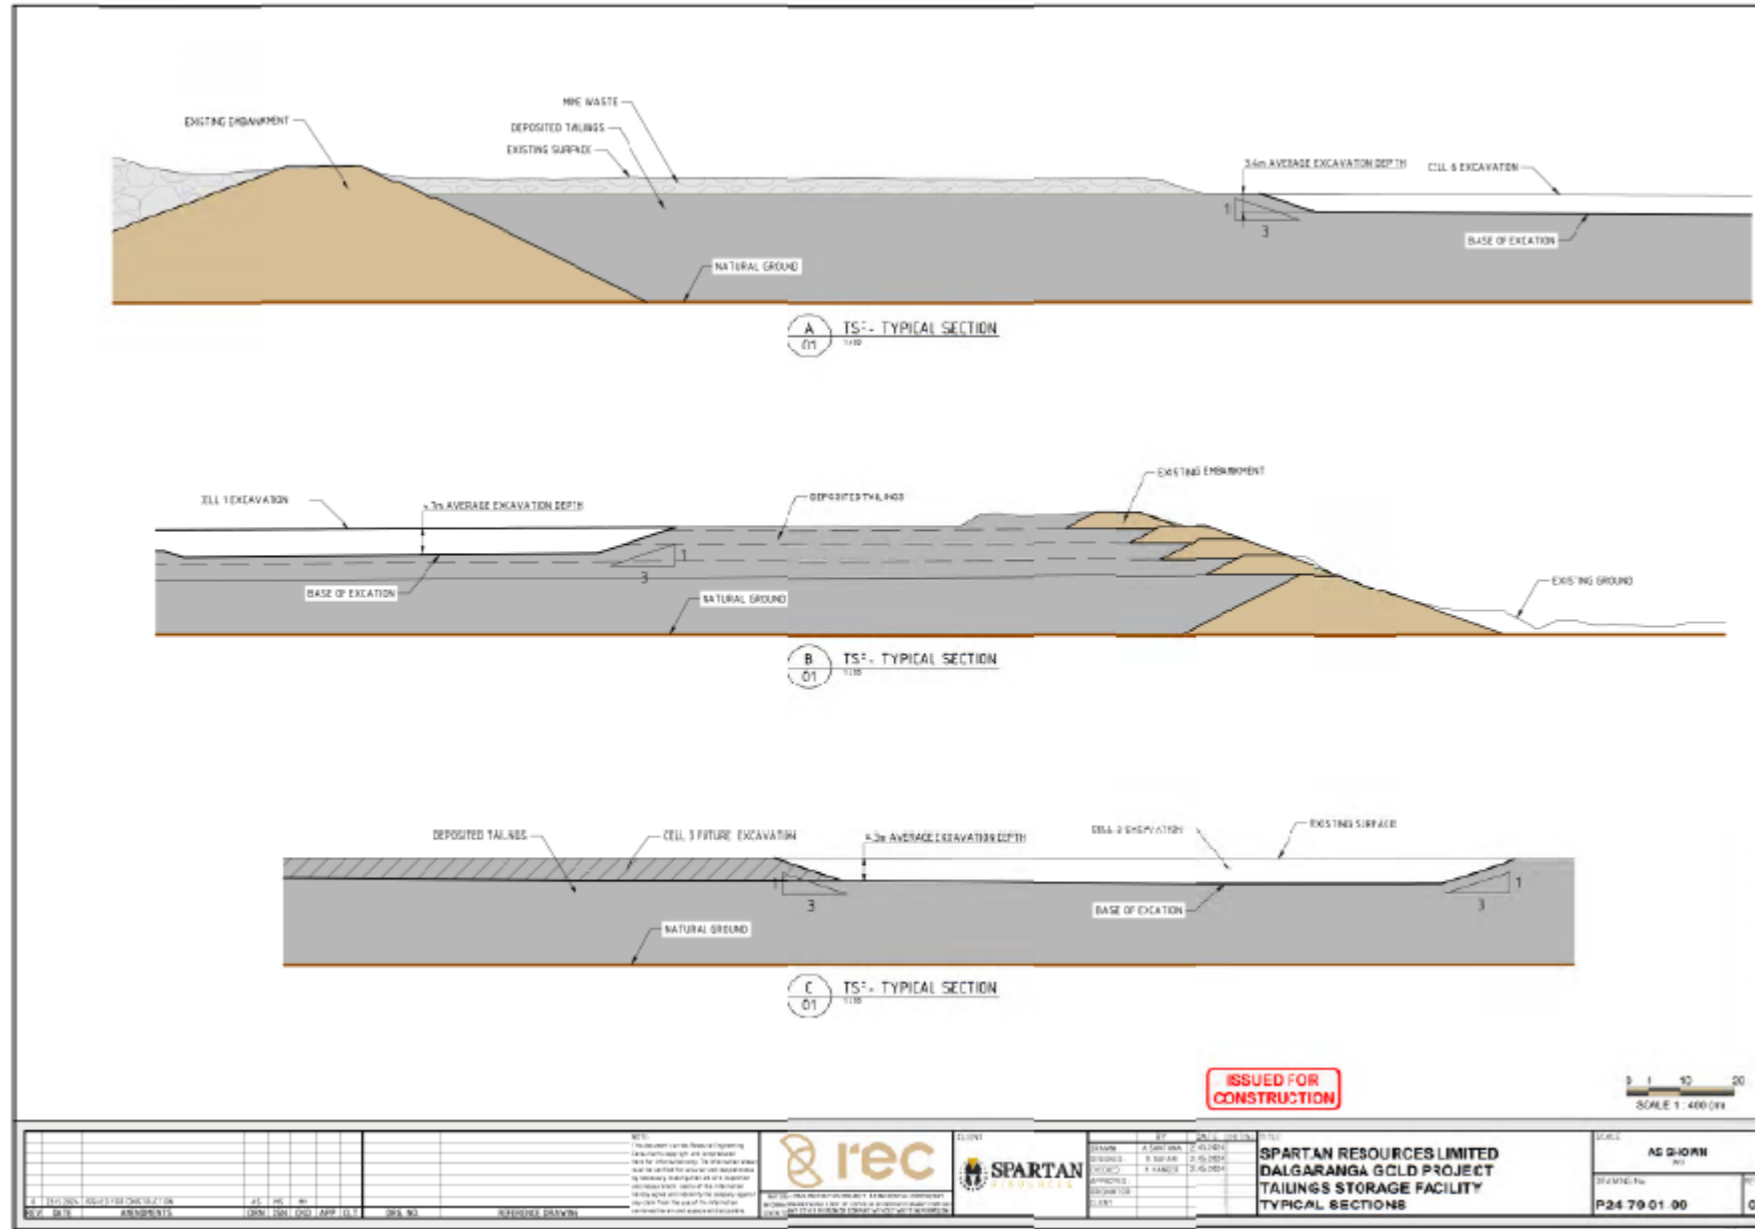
Gilbey's TSF reclaim cell design – typical sections
